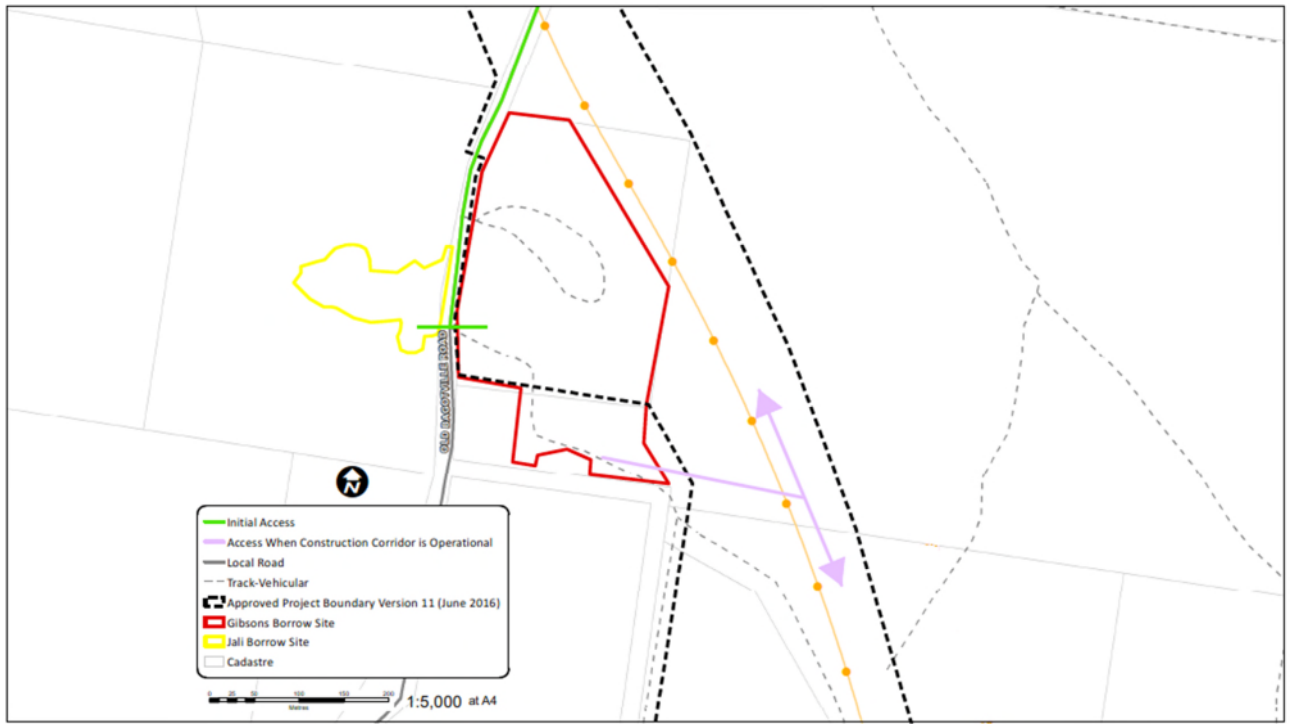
The locations of proposed Gibson's and Jali borrow sites, noting planned access points.
